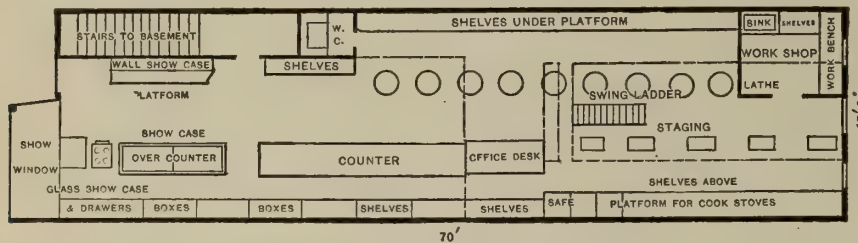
Ground Plan of Schiller House-Furnishing Co.'s Store.
